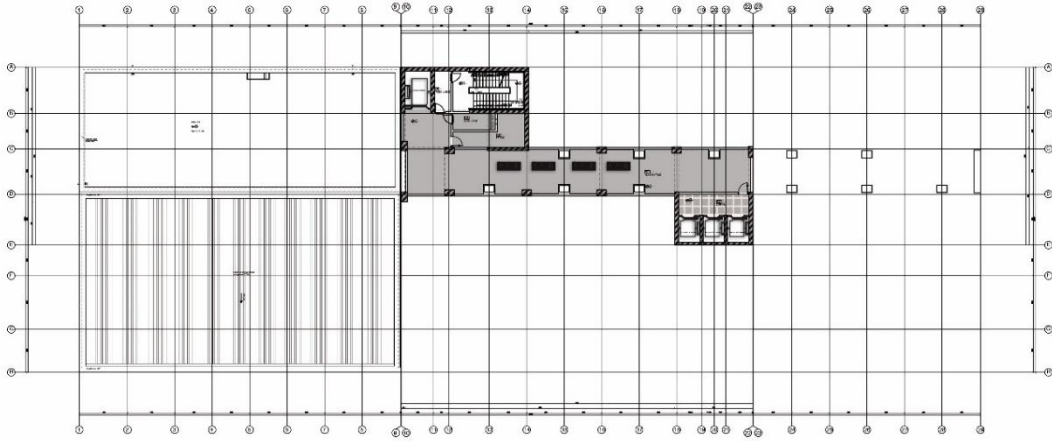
300-bed teacher's house ninth floor plan, Çelik, 2017
